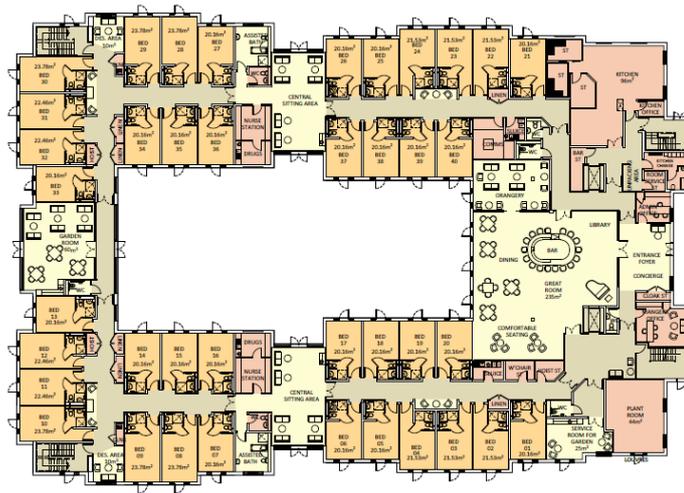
Proposed ground floor plan (Carless + Adams). All bedrooms at this level have access externally onto individual terraces with planting beds, including those that face into the internal courtyard. In addition to these individual terraces there is also a garden room to the western end which faces the lawns, meadow and orchard. A large communal room is shown to the east end of the building which will provide
